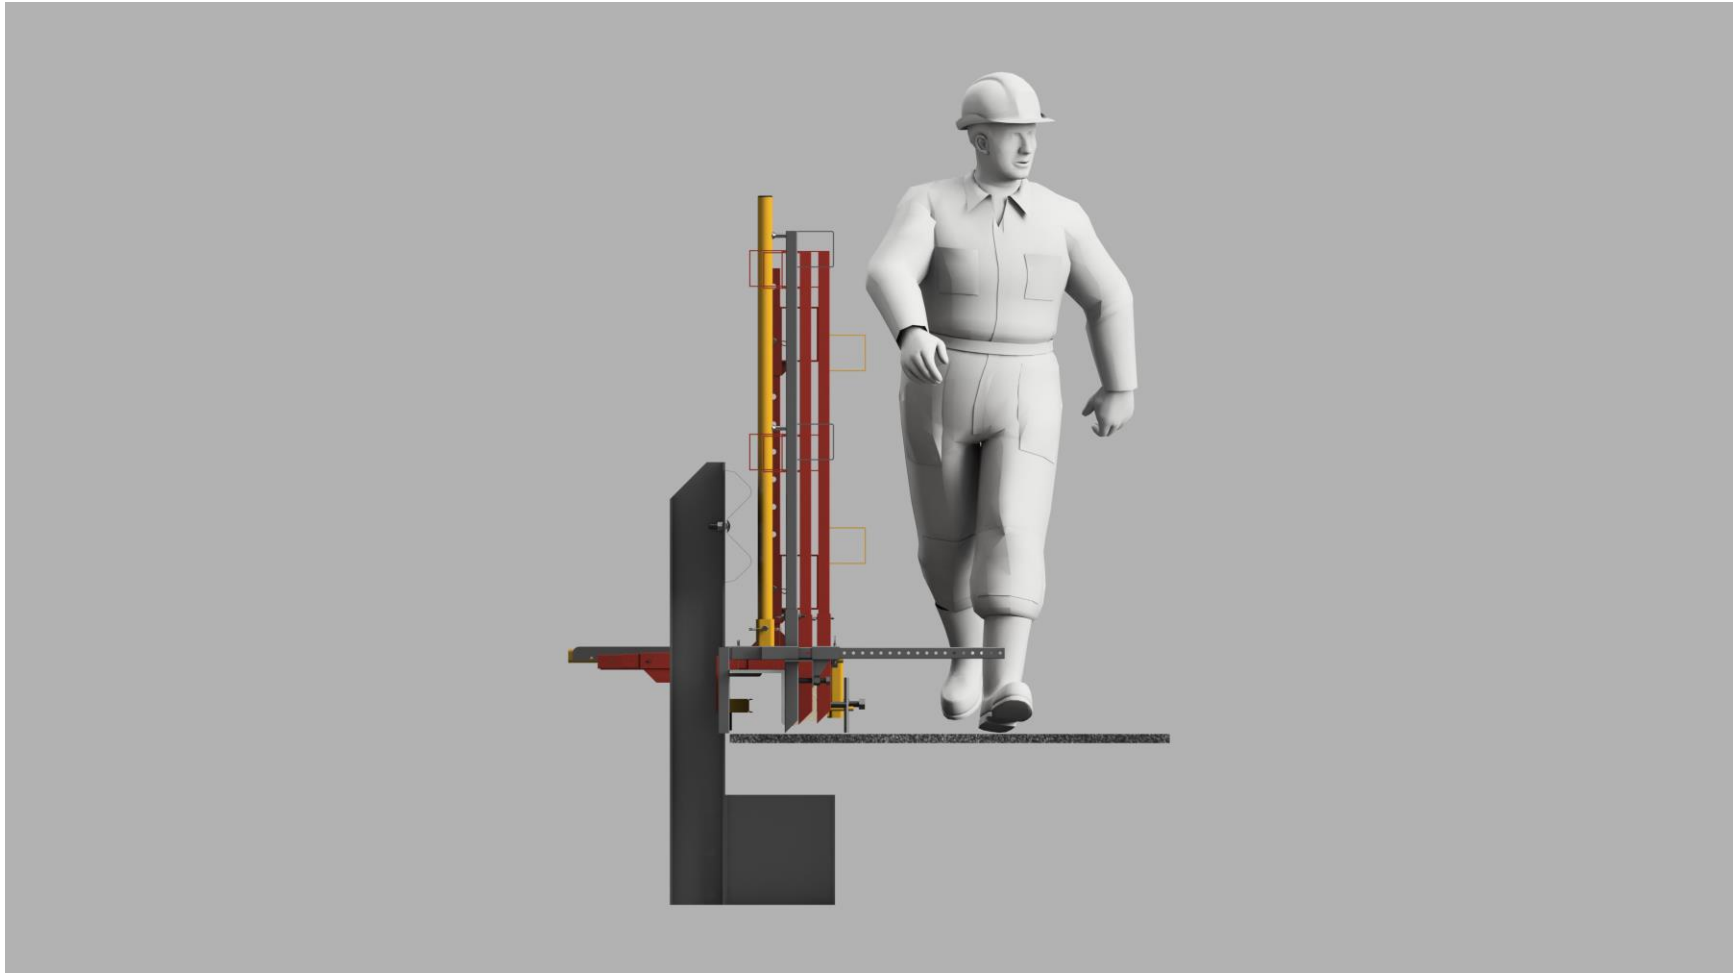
Guardrail Type 23, wheel guard fit; view from the south
